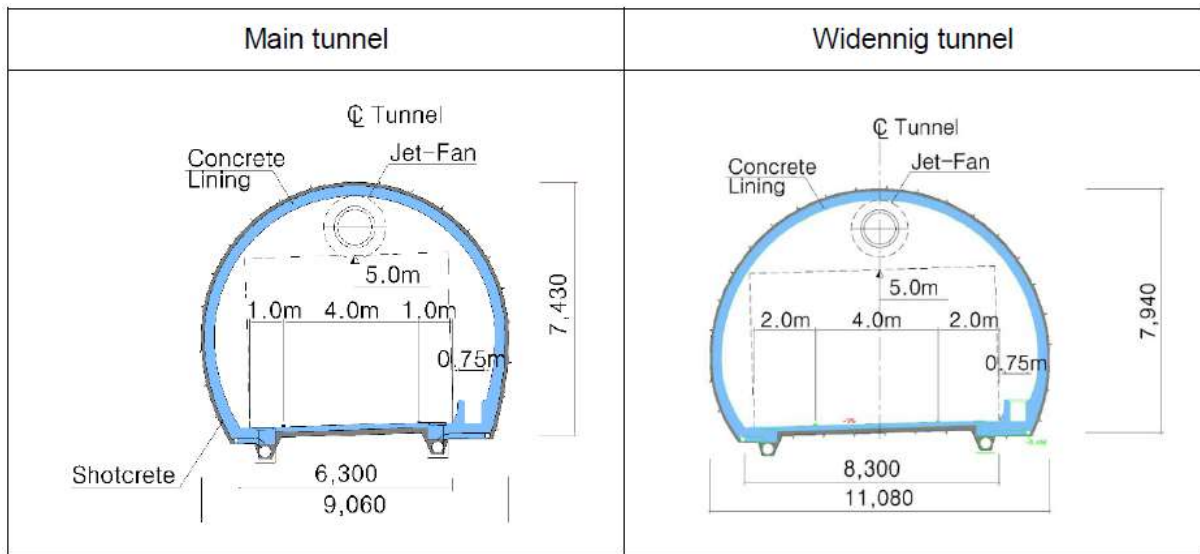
, 3.6, 3.7, and 3.8 present typical road, tunnel, and bridge cross-sections or profiles.
